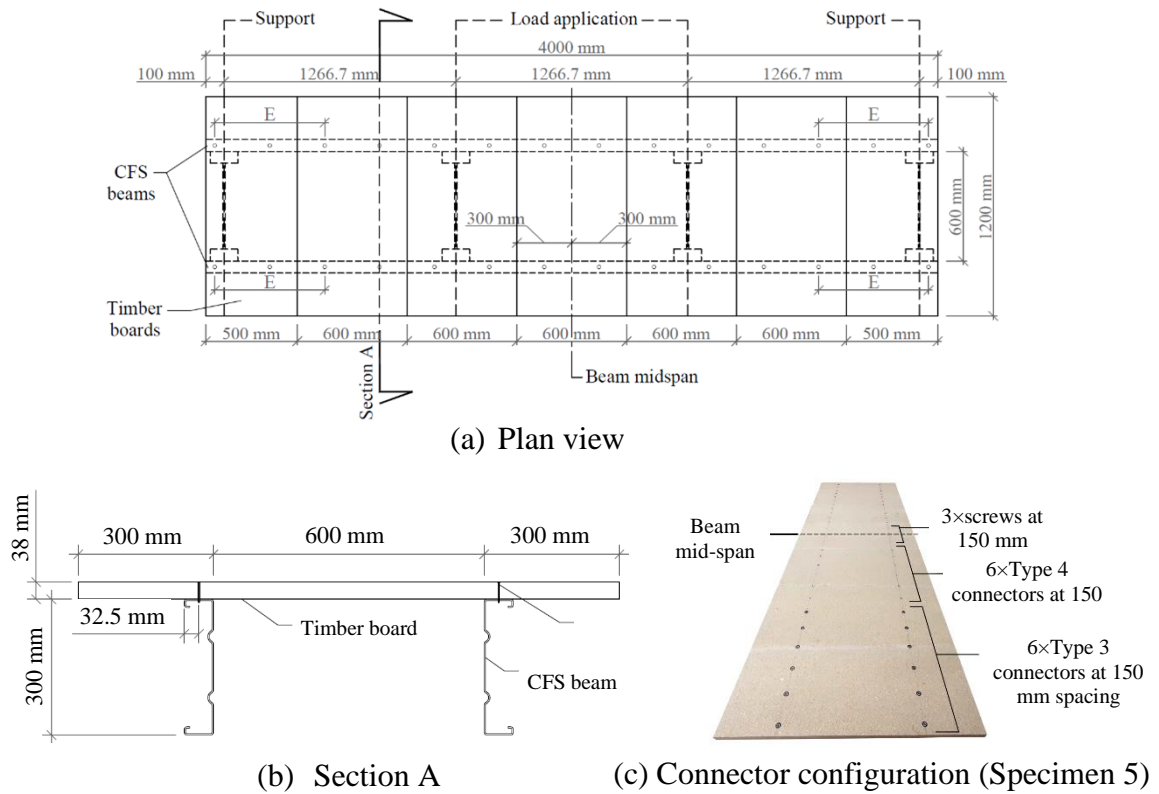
Composite beam specimen details: (a) Plan view, (b) Section A, (c) connector configuration of Specimen 5
